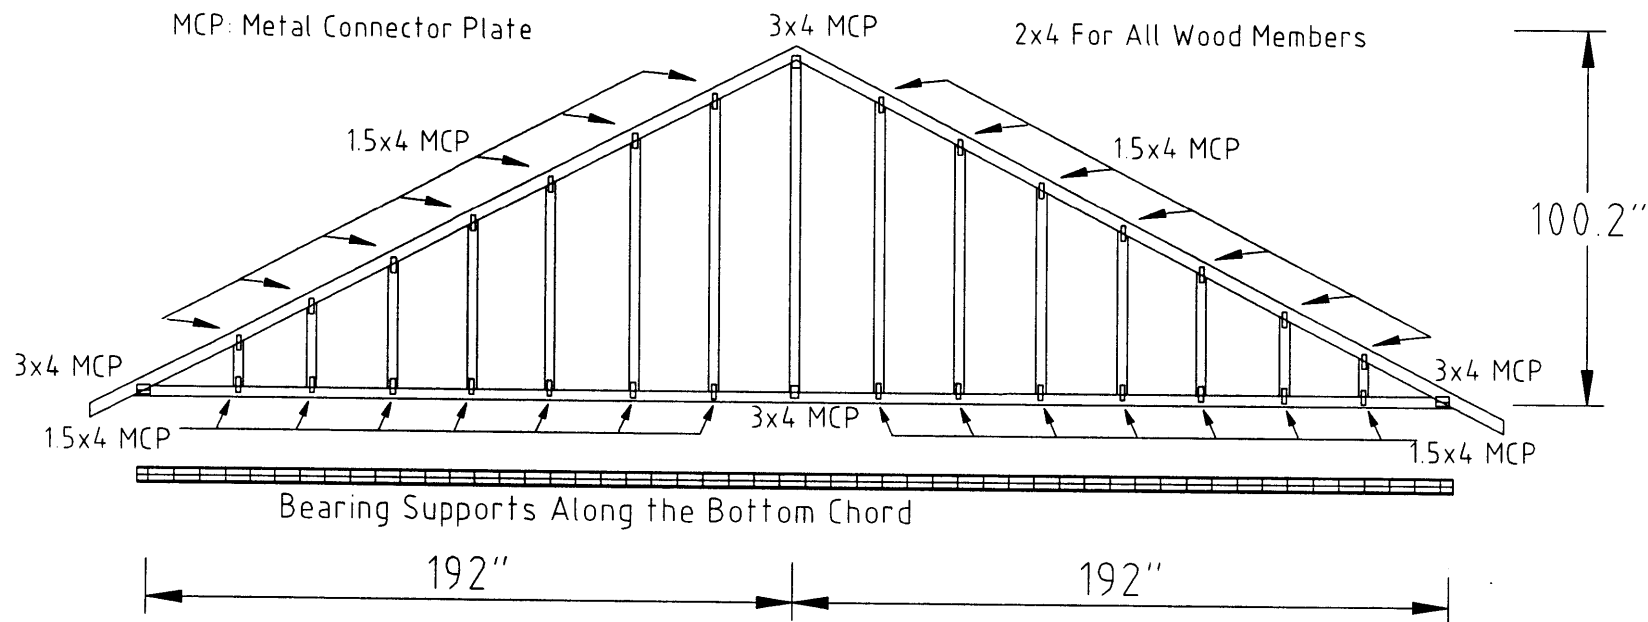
MPC Truss Type AGB from a Truss Plate Manufacturer
